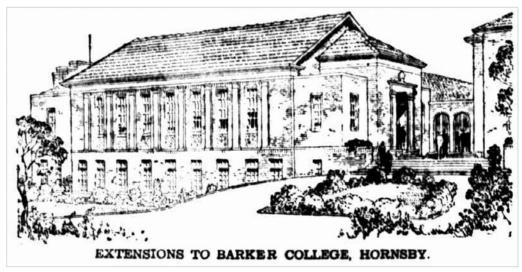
Sketch drawing of 'Extensions to Barker College, Hornsby', published in the Sydney Morning Herald in January 1938, and showing the proposed east elevation of the new building which contained an assembly hall on the upper floor, and classrooms, laboratory and library on the ground floor. (Source: Building and Construction, Sydney Morning Herald, 25 January 1938, 8, http://nla.gov.au/nla.news-article17421818).
